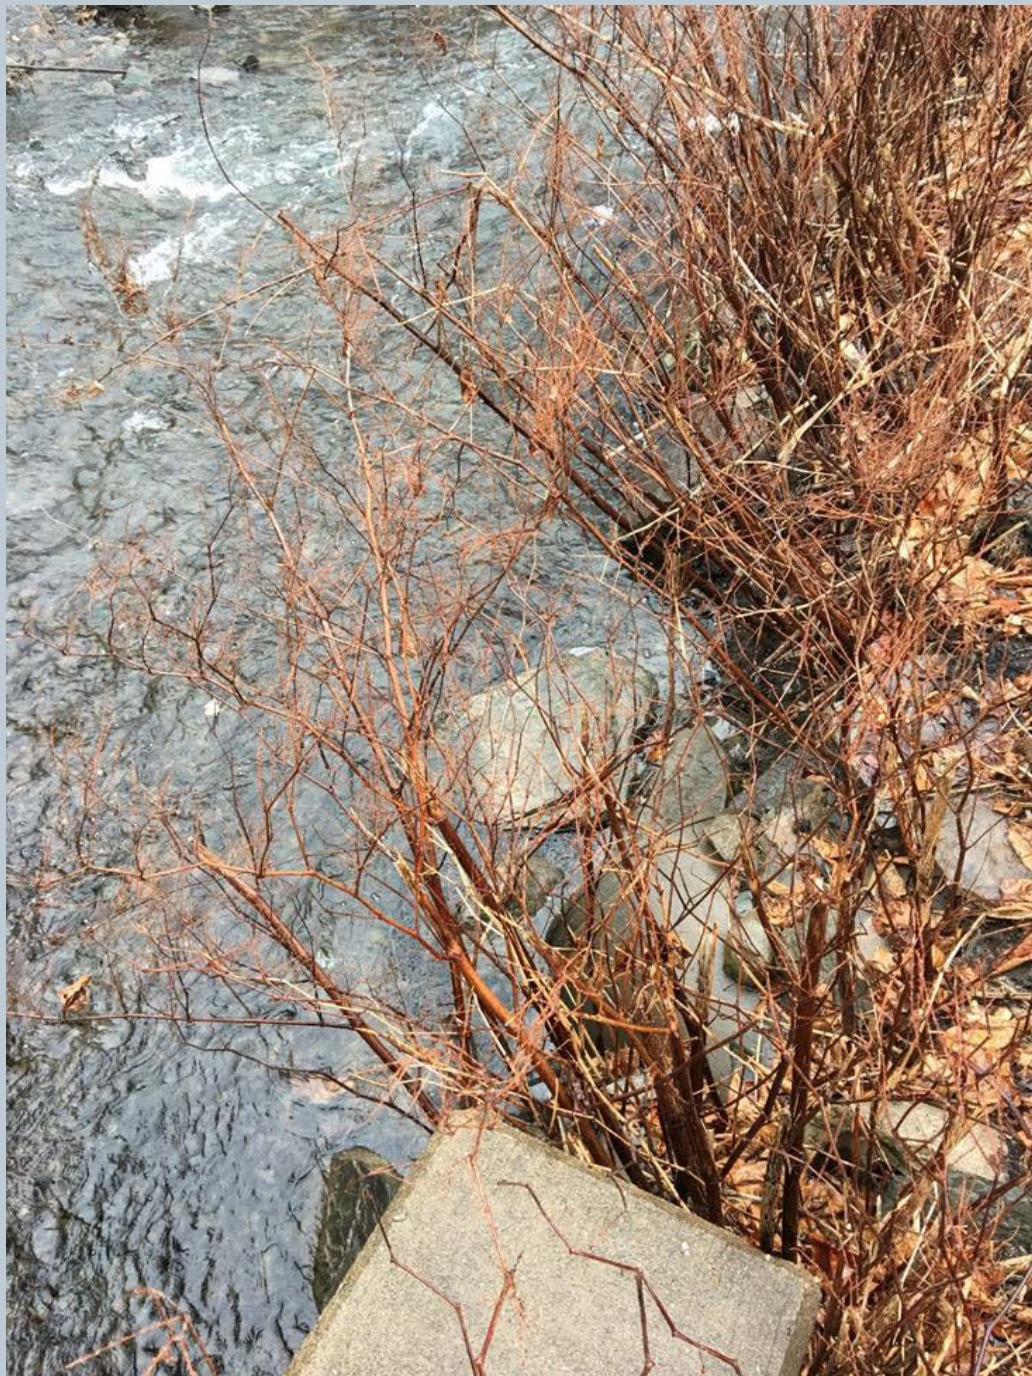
A shot of a 24-inch concrete stormwater pipe (dry) aligned with Toby Creek, below the wingwall off of N. Main Street.
